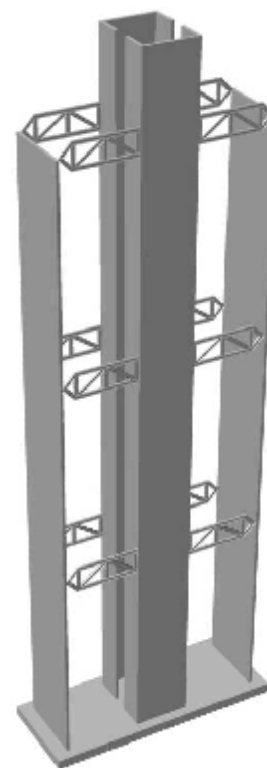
Schematic of a shear wall group coupled by steel trusses. Pin connections at the exterior walls prevent the introduction of moments about the weak axes of the walls. (Courtesy N. Sosin)
